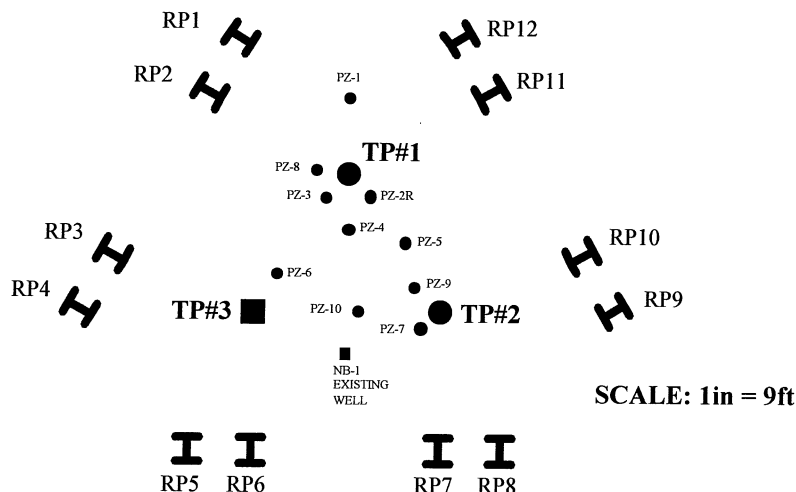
Newbury test site layout (after Paikowsky and Hajduk, 1998).
